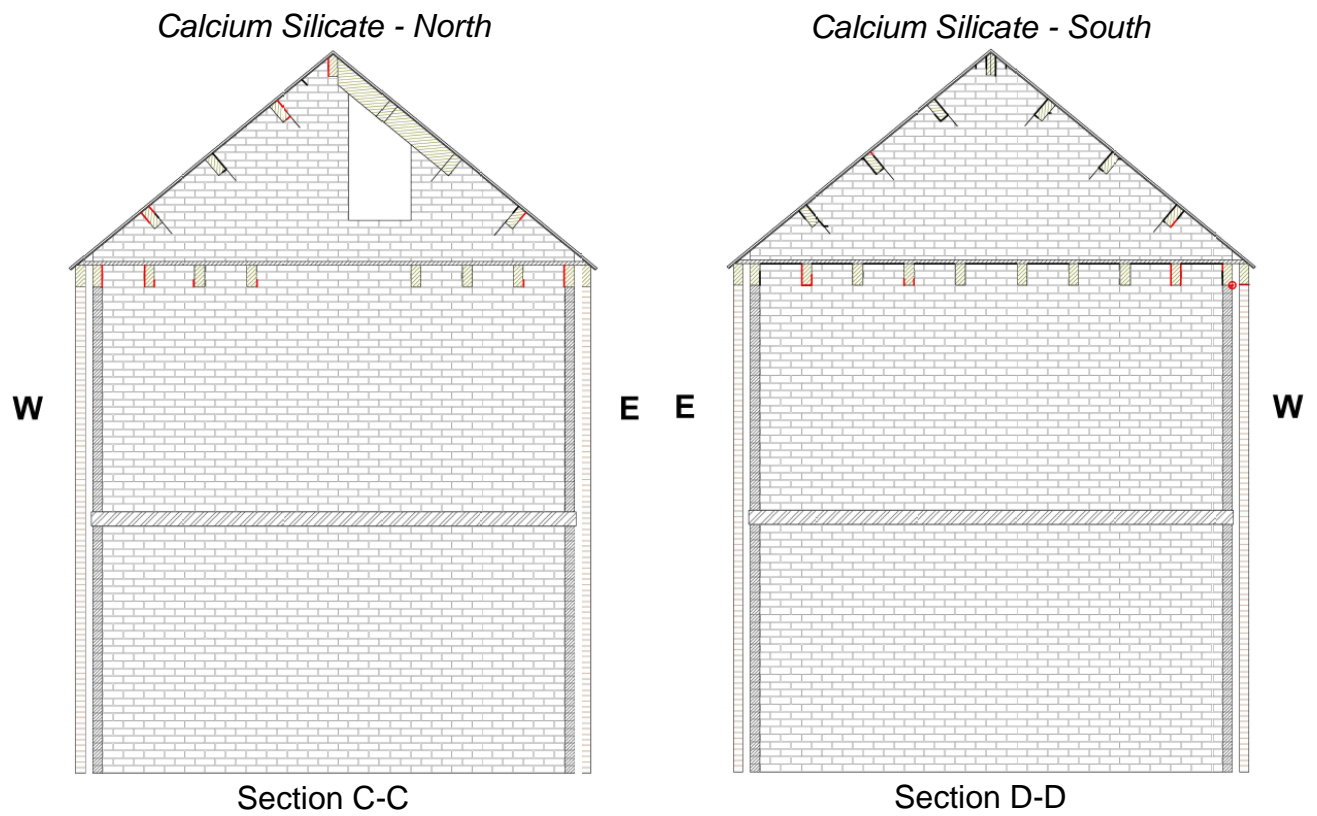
EQ-NPR 50% cracks - Calcium silicate transverse walls.
